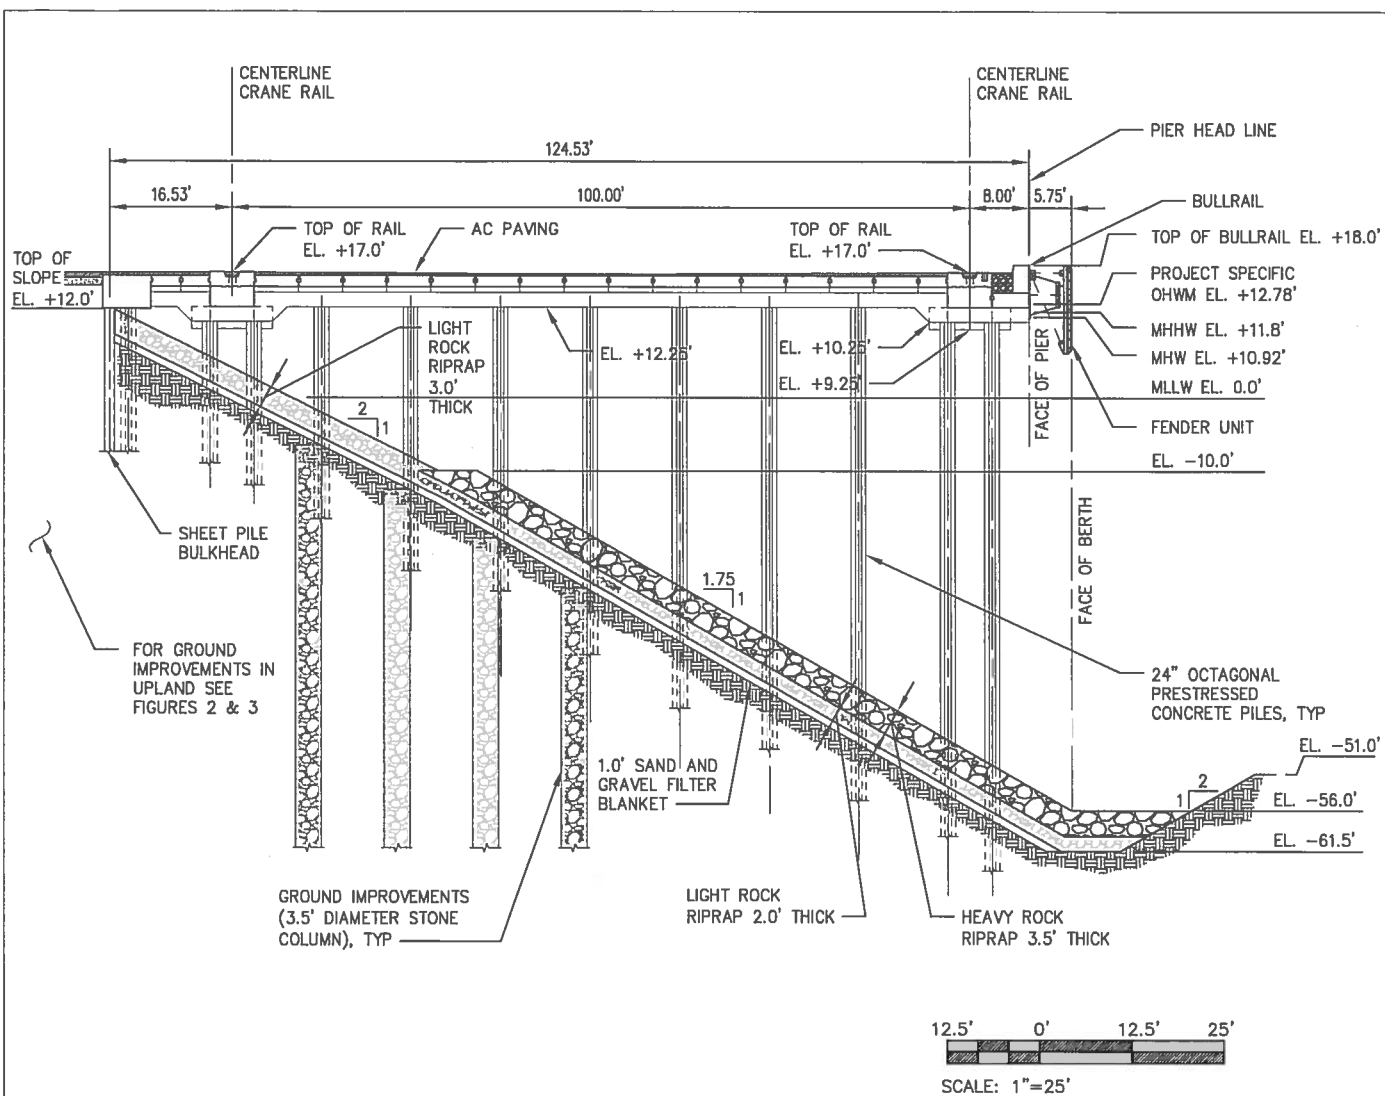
DREDGE AND SLOPE PROTECTION PLAN
